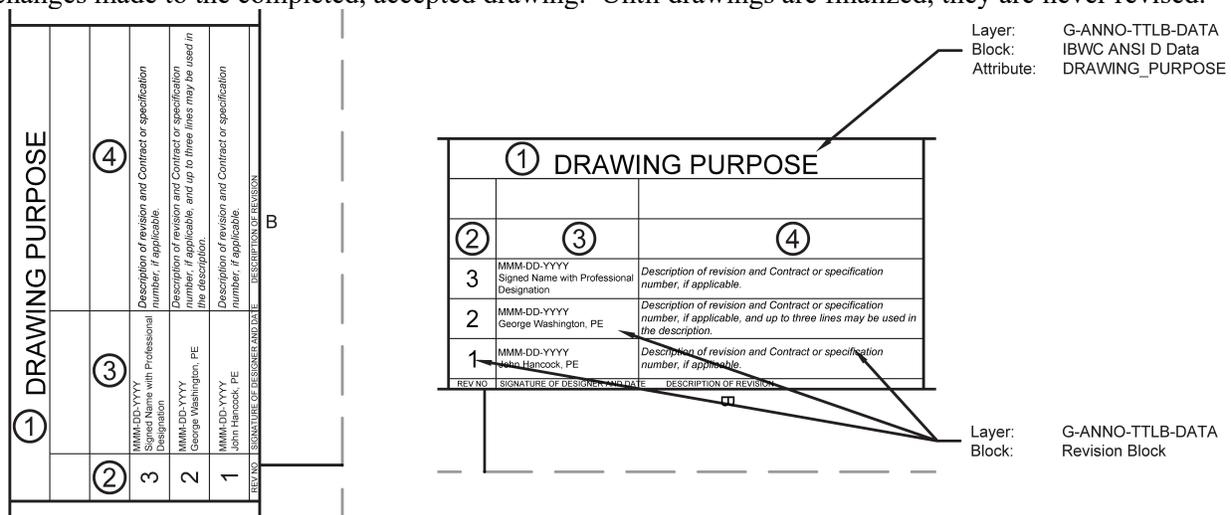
USIBWC Border: Drawing Purpose & Revision Block
